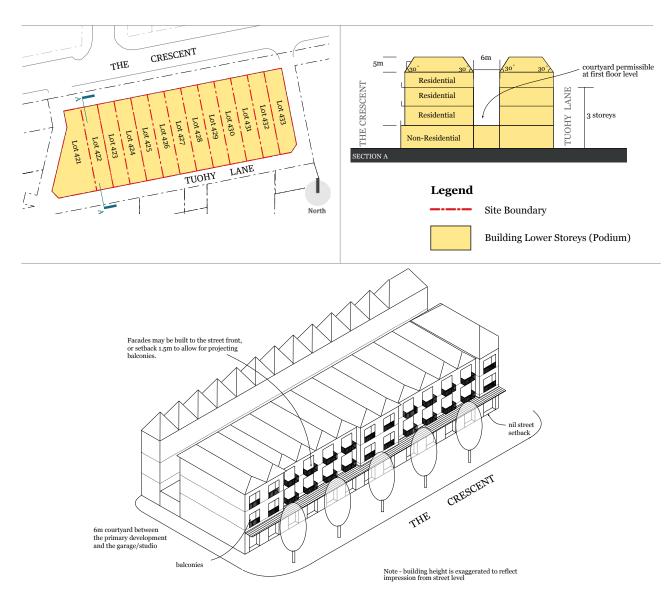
SOUTH OF THE CRESCENT SITE SPECIFIC PLAN
